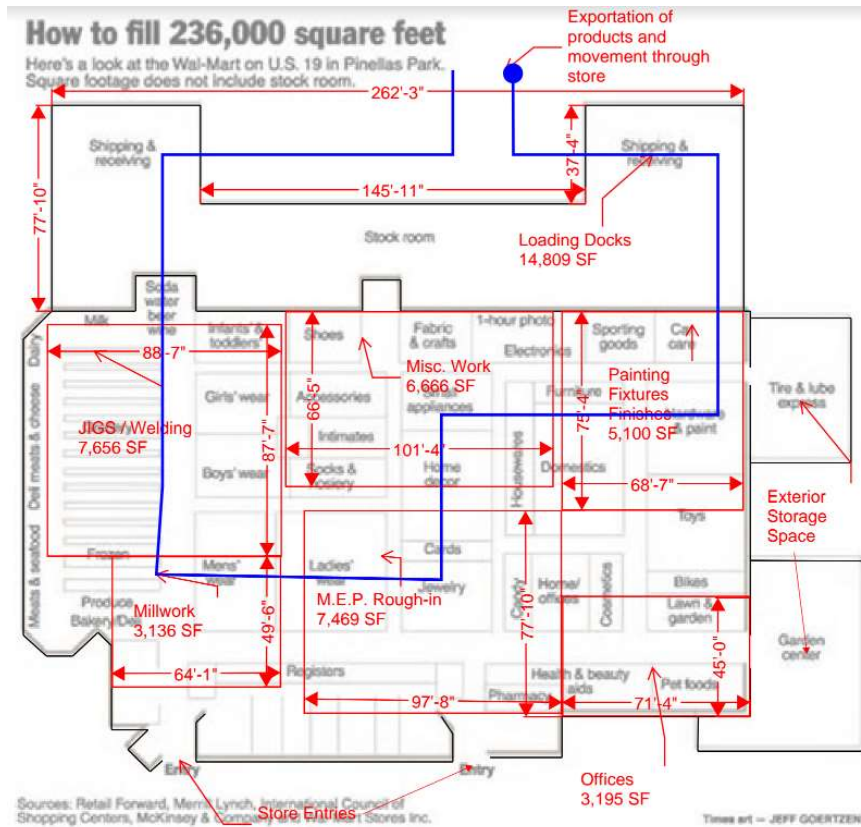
Wal-Mart Supercenter Overlay/Publix Floor plan Example
